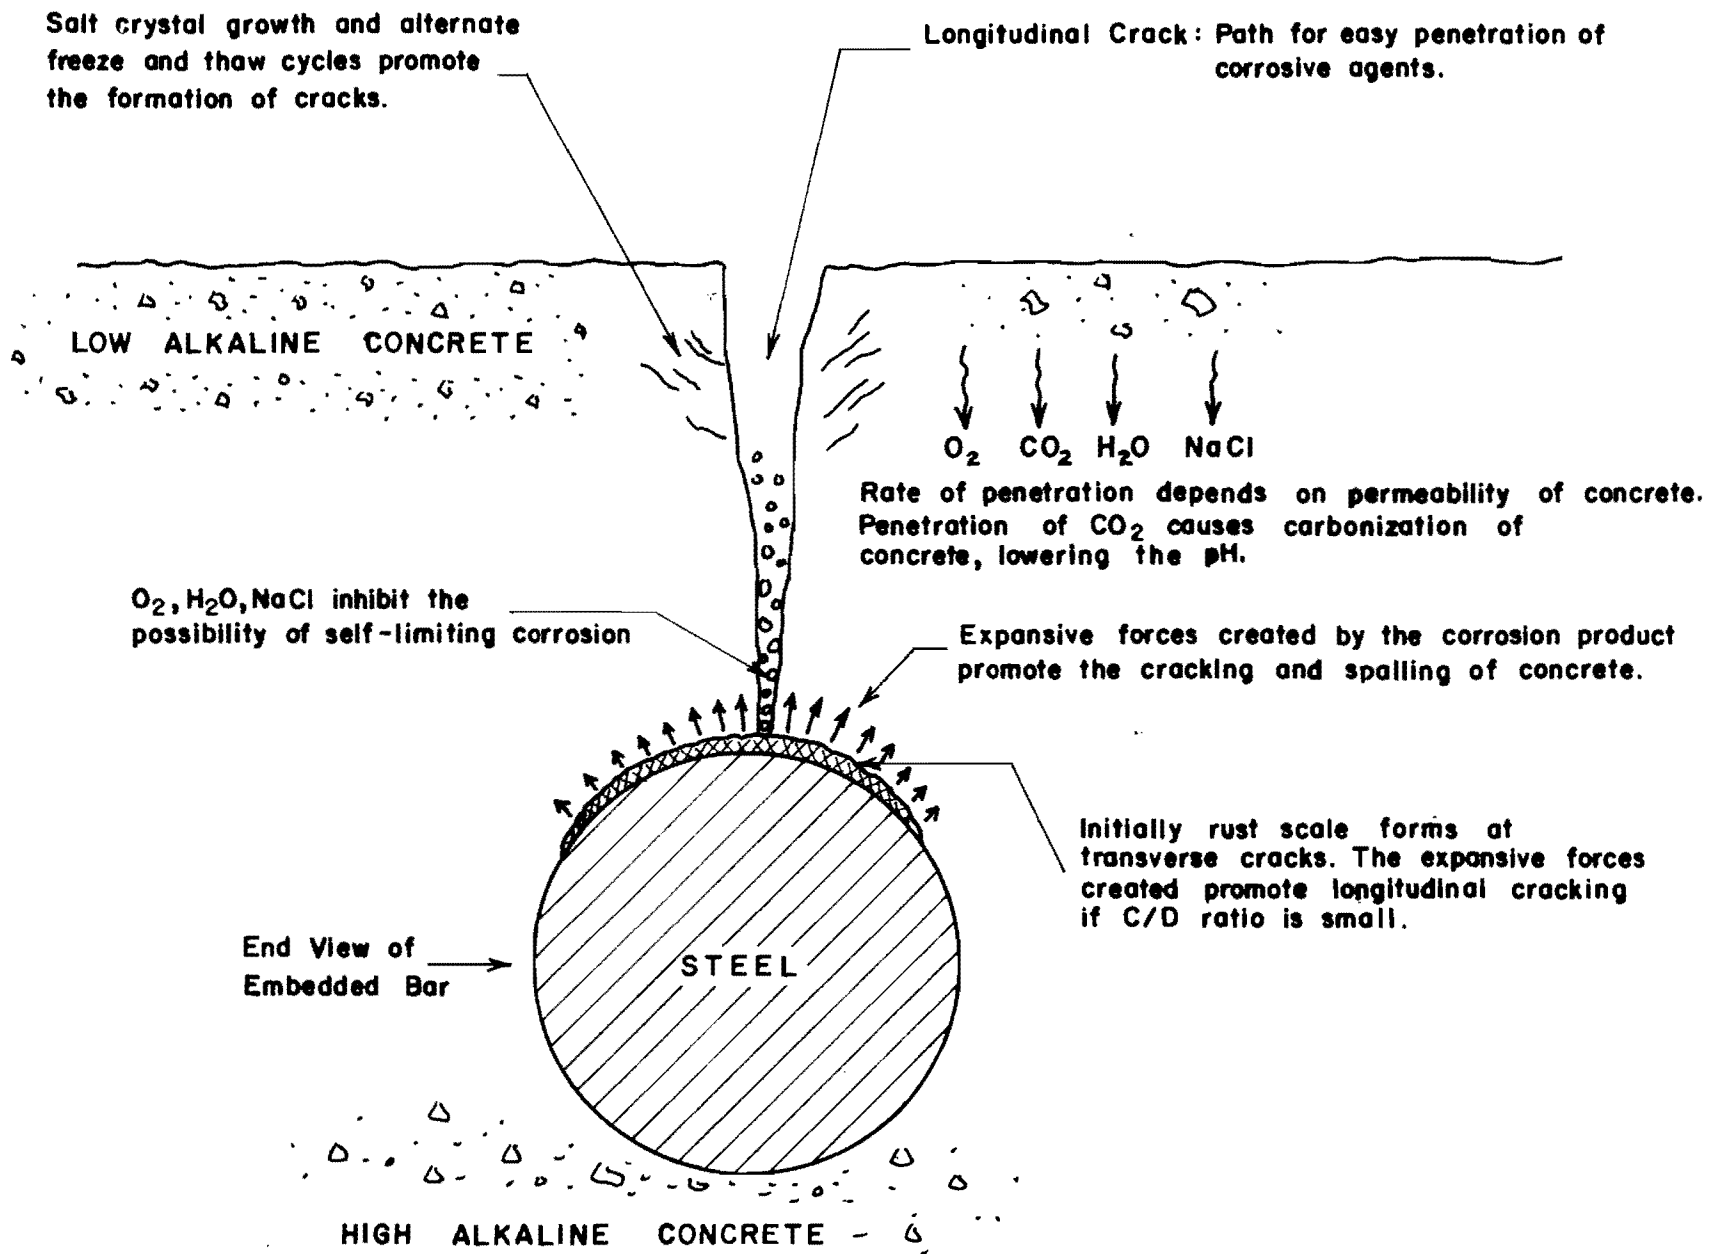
General mechanism for the corrosion of reinforcing steel in concrete.
